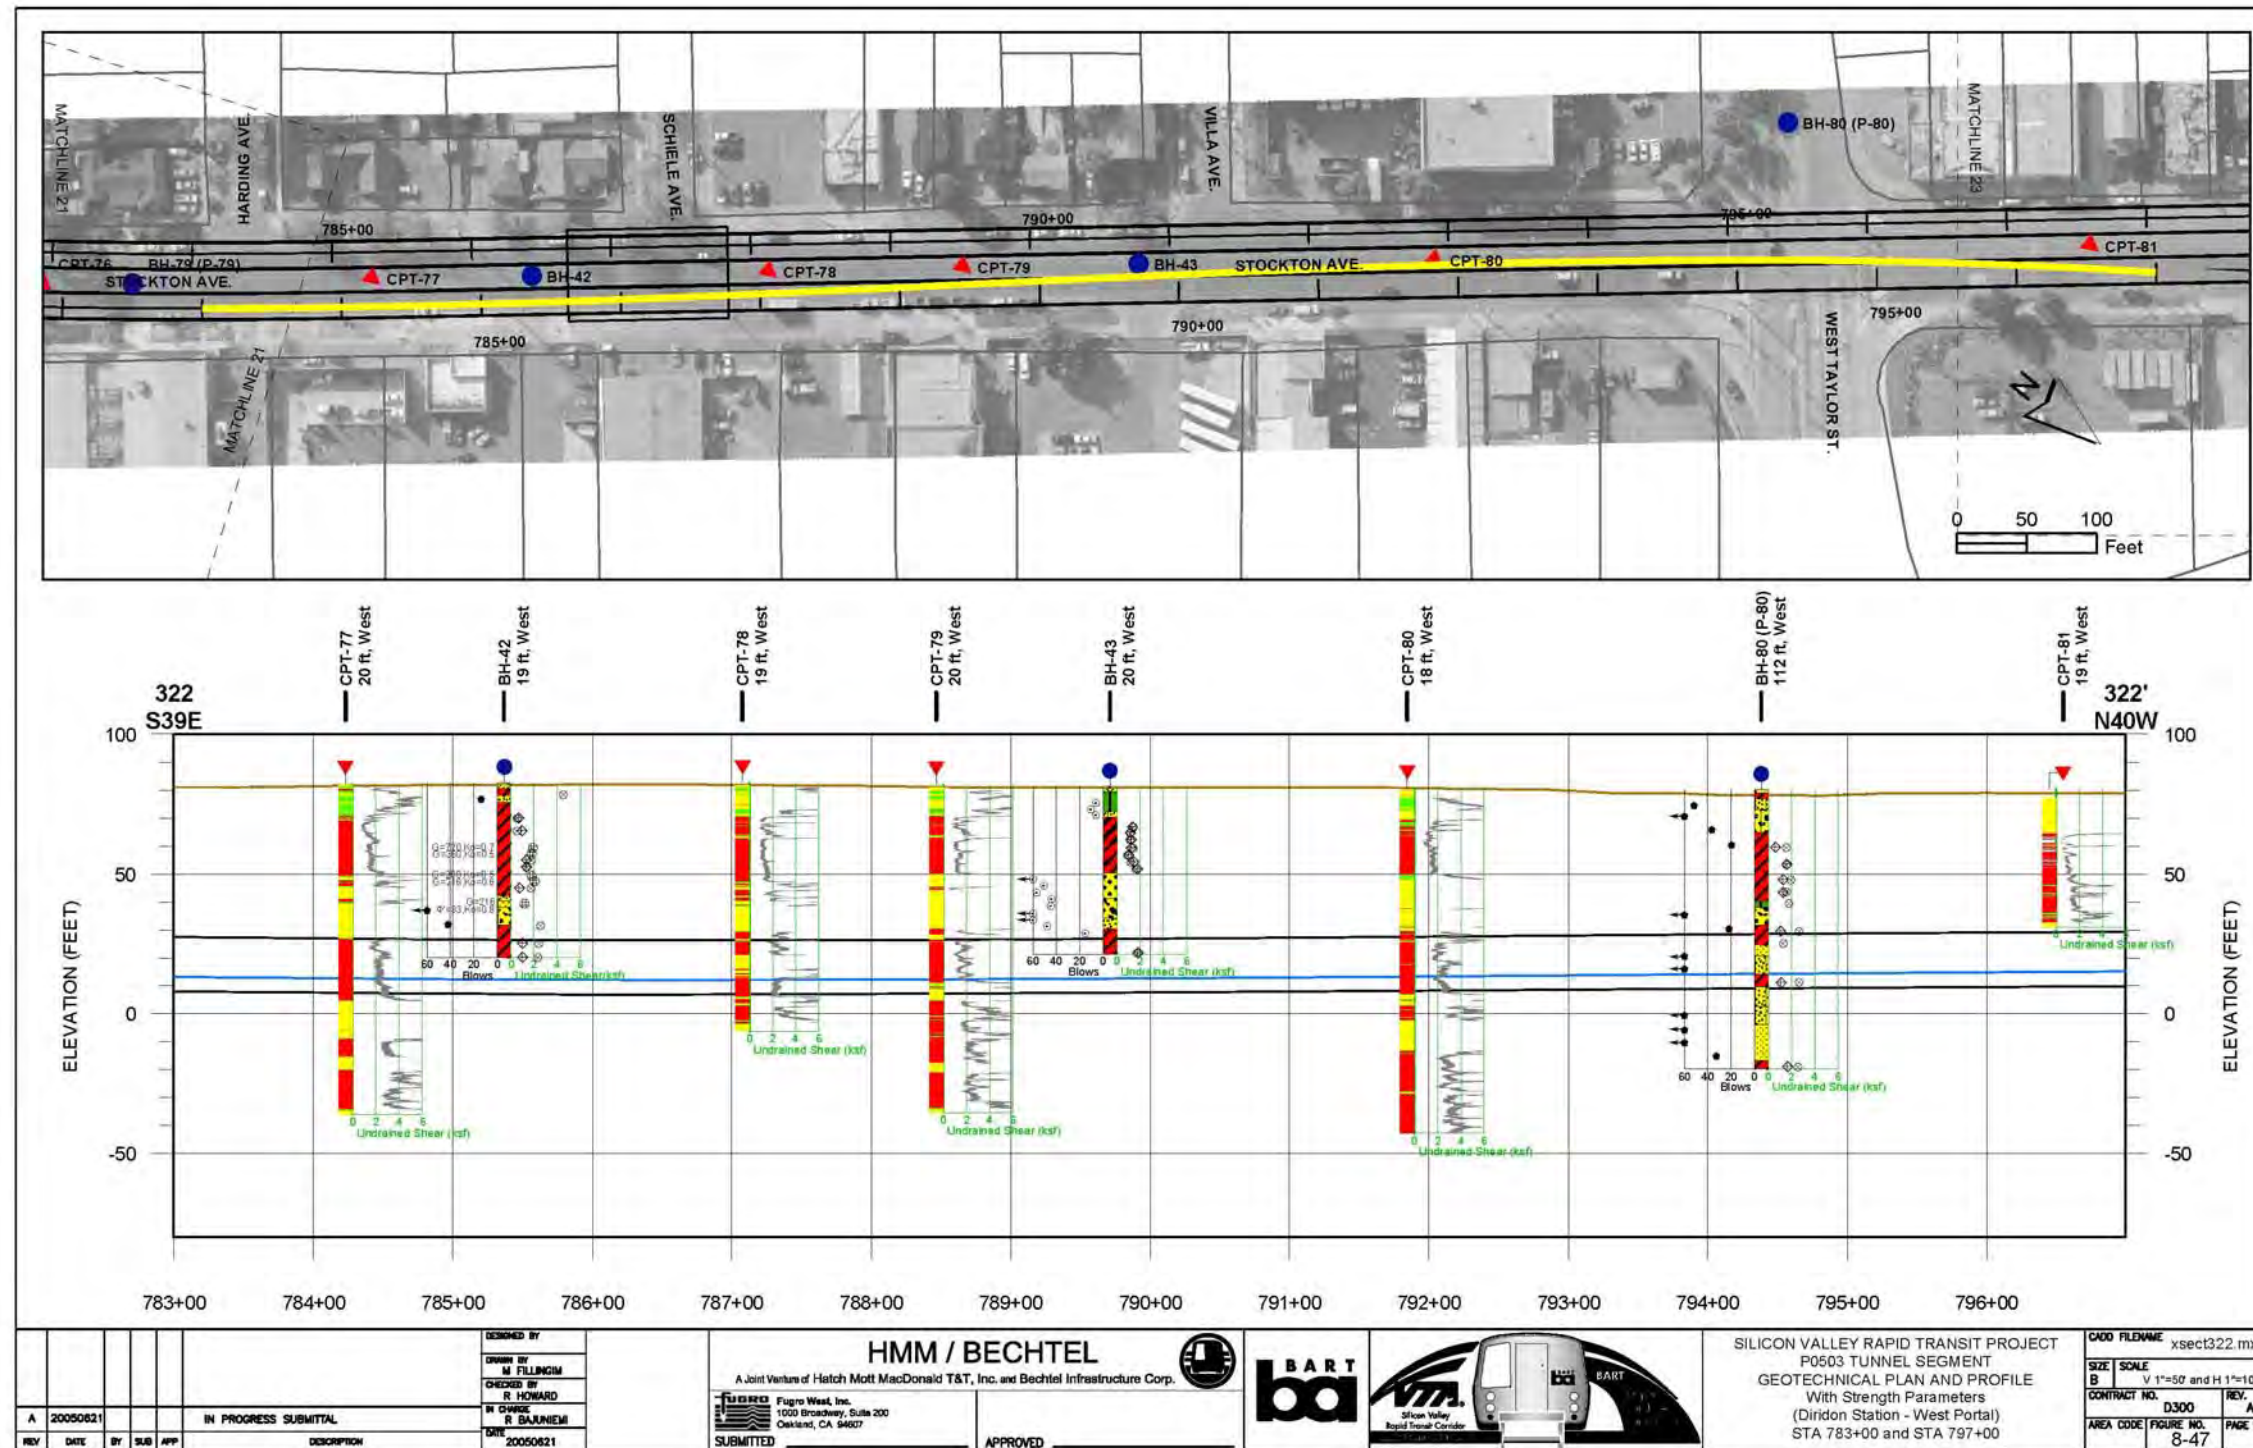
Geotechnical Plan and Profile with Strength Parameters: 783+00 to 797+00.
